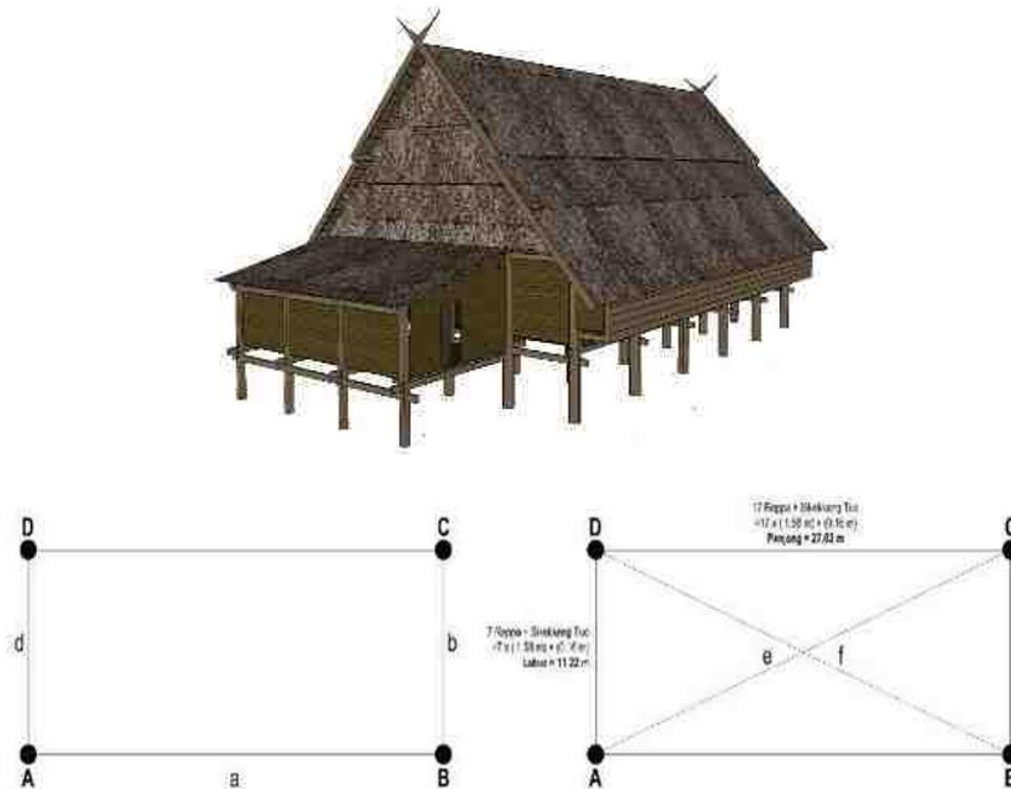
3D model and Floor Plan Dimensions of Karampung Traditional Custom House
